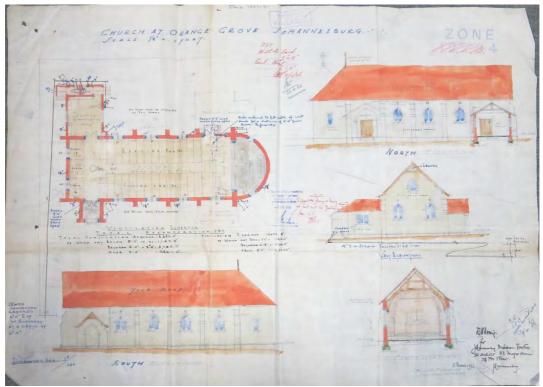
Plan for New Church at Orange Grove designed by F.L.H. Fleming in 1936 (Source: City Council of Johannesburg, Plans Archive)
